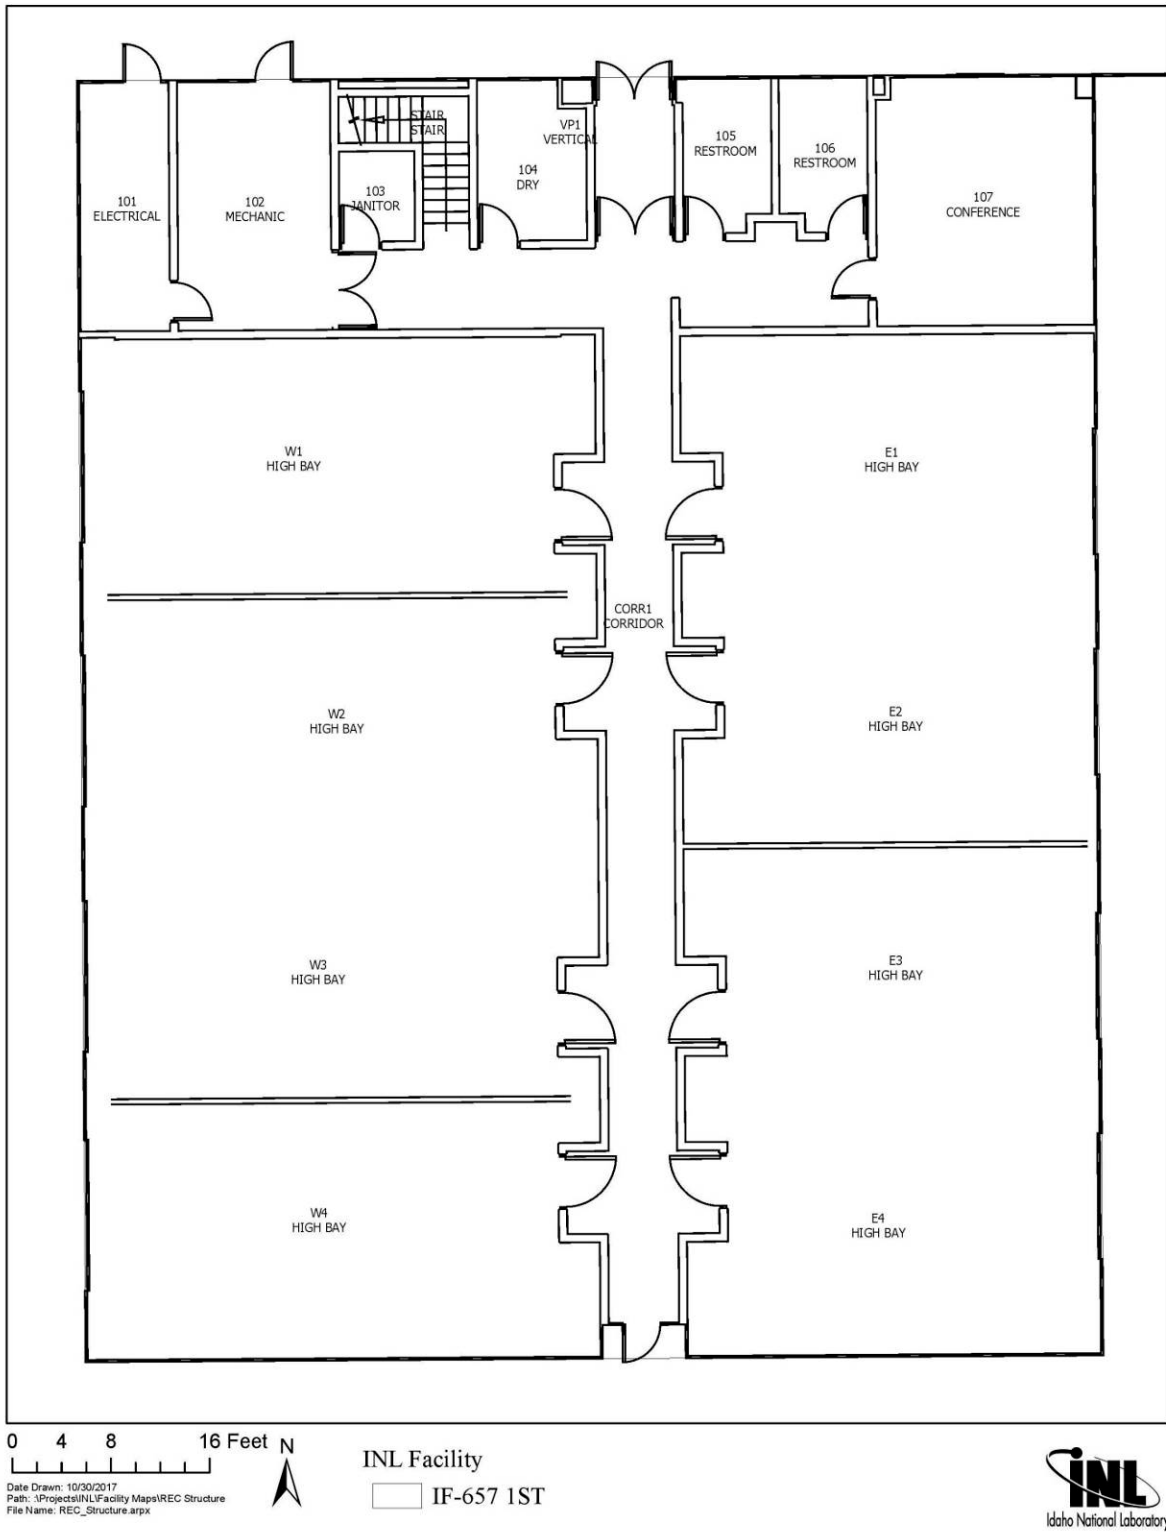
IRC Idaho National Laboratory Engineering Demonstration Facility (IF-657) floor plan (1st floor).
